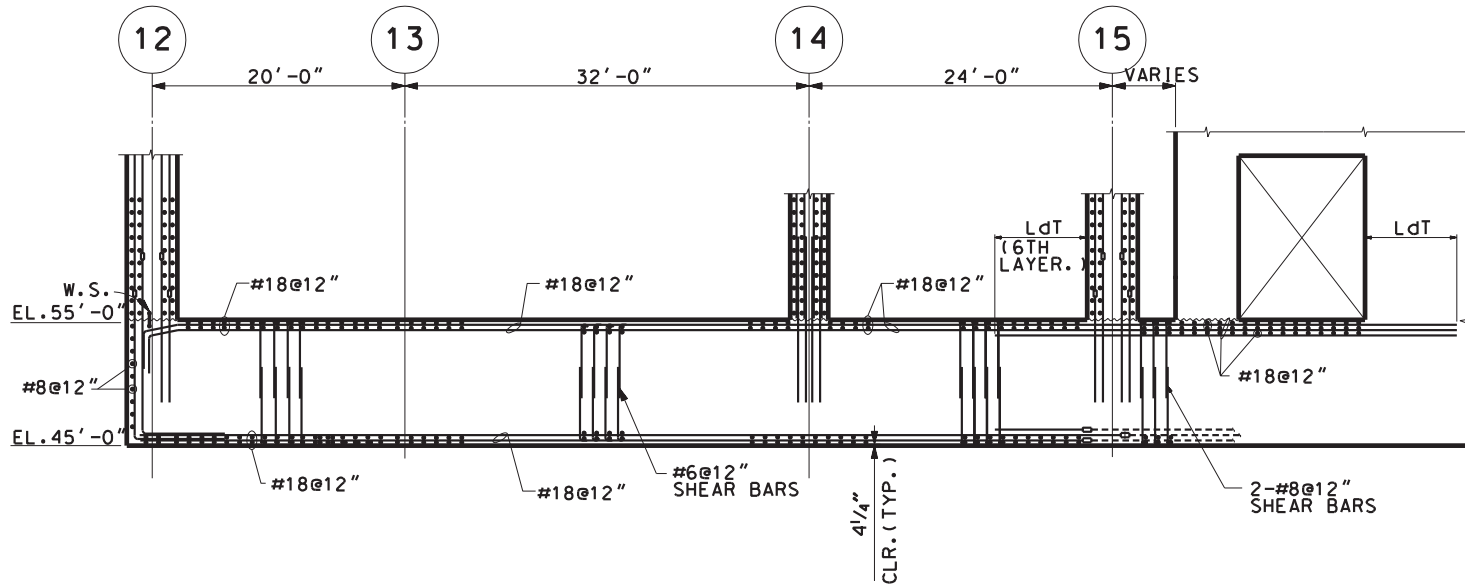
A-37 Typical Reinforcement of the AB Basemat (Section A)
